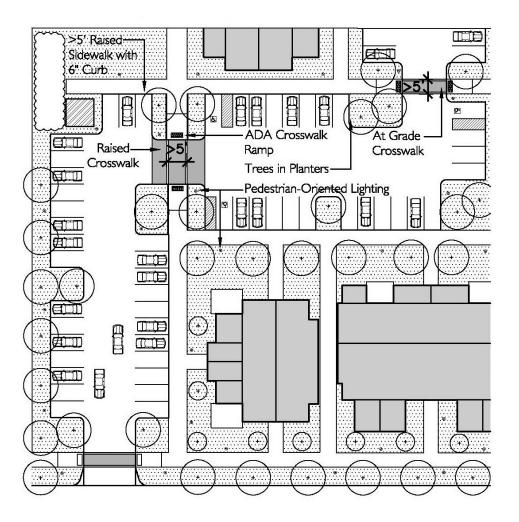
B.4. Dividing Parking Lots into Separate Areas
